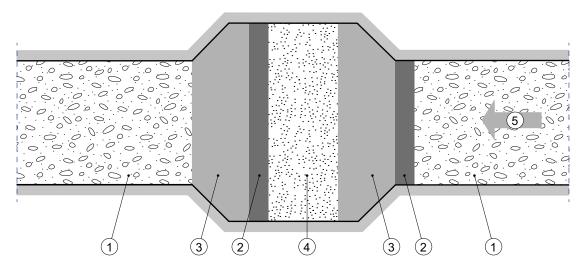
Schematic design of a sealing plug (Luterkort et al. 2014). Legend: 1) Backfill of crushed rock or similar. 2) Retaining concrete walls. 3) Cast concrete. 4) Bentonite. 5) Backfill direction (from the waste vault and out). 6) Backfill material.
